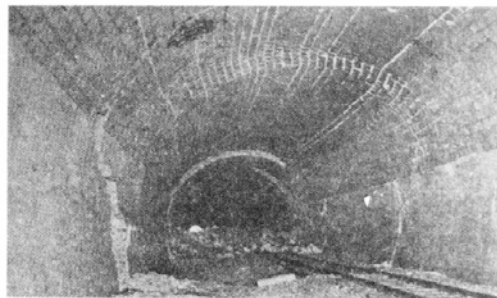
Cracks Appeared in the Lining of Nagasakayama Tunnel after the 1923 Kanto Earthquake (after Okamoto³).
